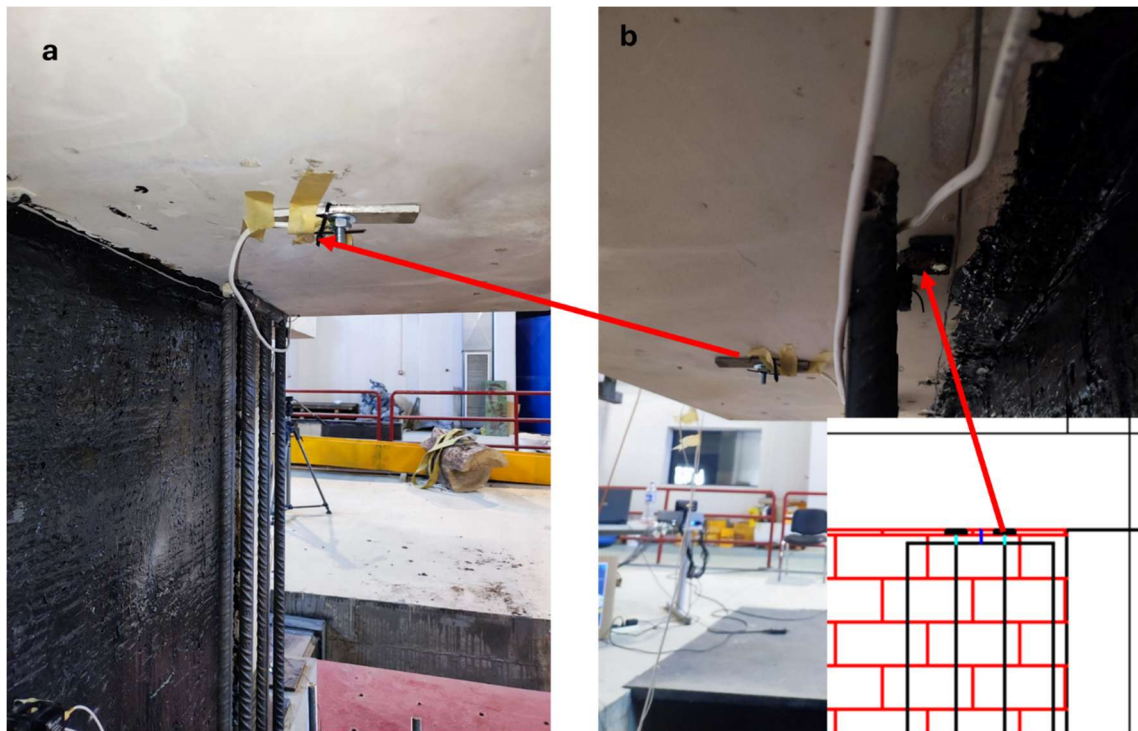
PZT patches installed on the anchoring of metal structures for the (a) planter and (b) Living wall structure.
